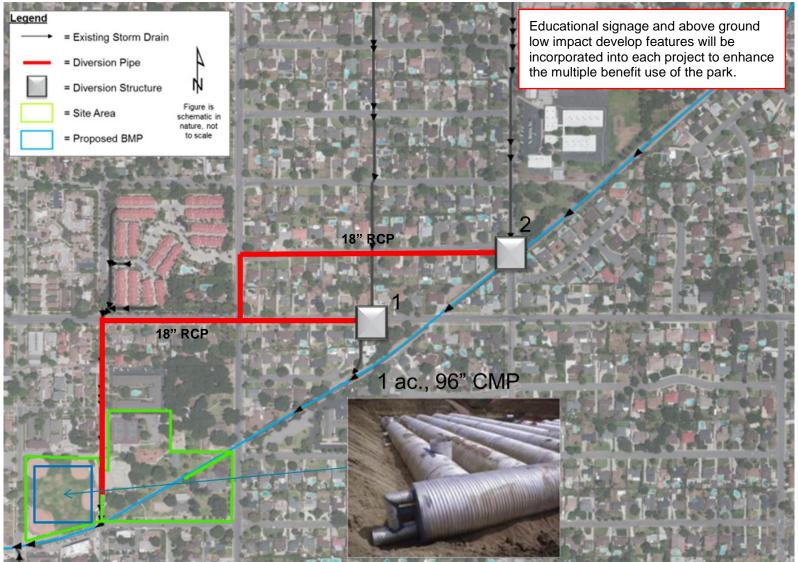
Finkbiner Park – Alternative – Preliminary Layout
